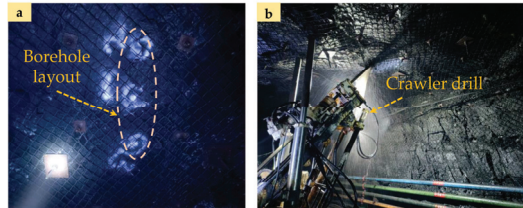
Site construction. (a) Layout of part boreholes in roof. (b) Crawler drill.
